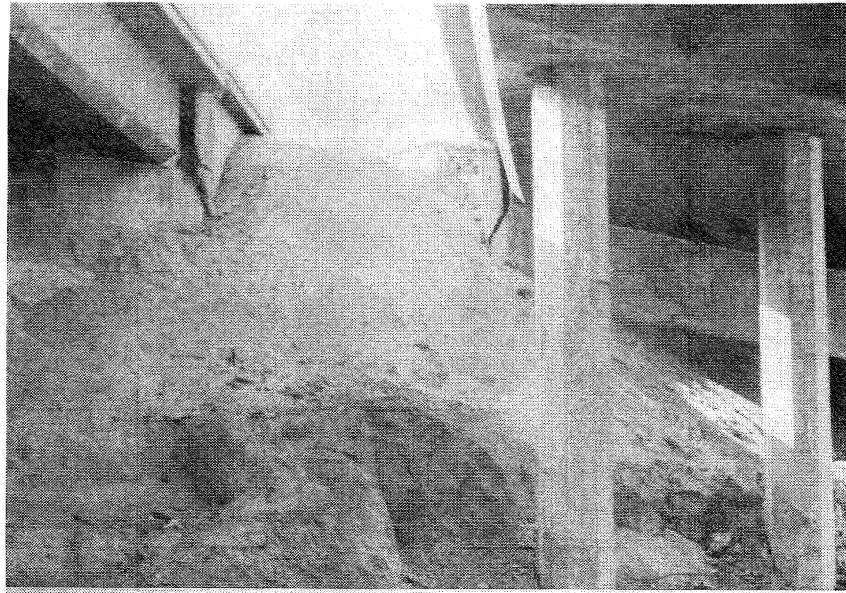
Abutment damage at the northern end of the west Sylmar Overhead bridges, Golden State freeway. Apparently the skew superstructures were structurally separated from the abutments and seated on elastomeric pads. The abutment wingwalls failed at both ends of the bridges.
